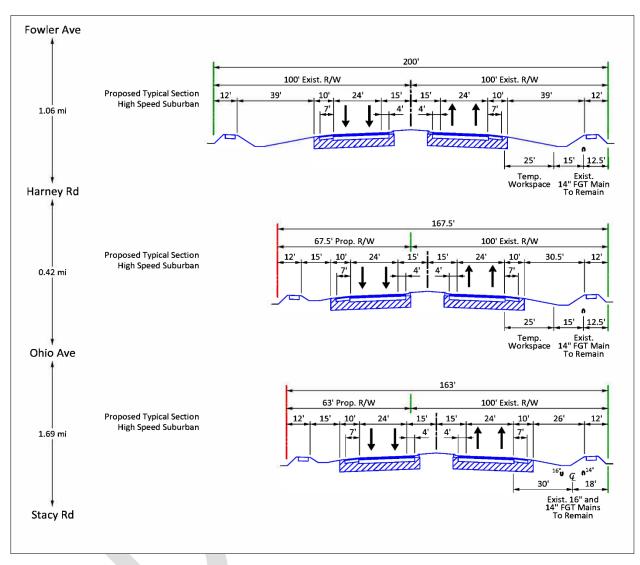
West-Side Widening Alternative from Fowler Avenue to Stacy Road
